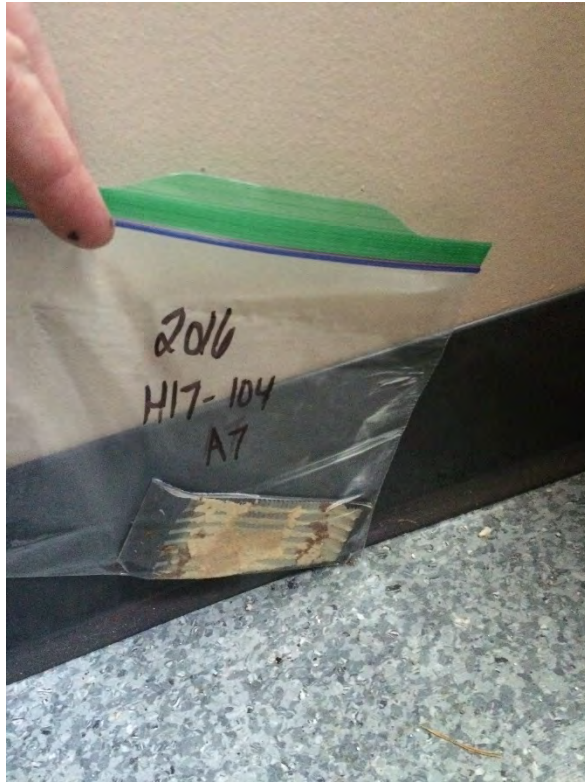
Asbestos sample A7, dark brown vinyl baseboard and adhesive collected from H17-104. No asbestos detected in floorboard or adhesive.
